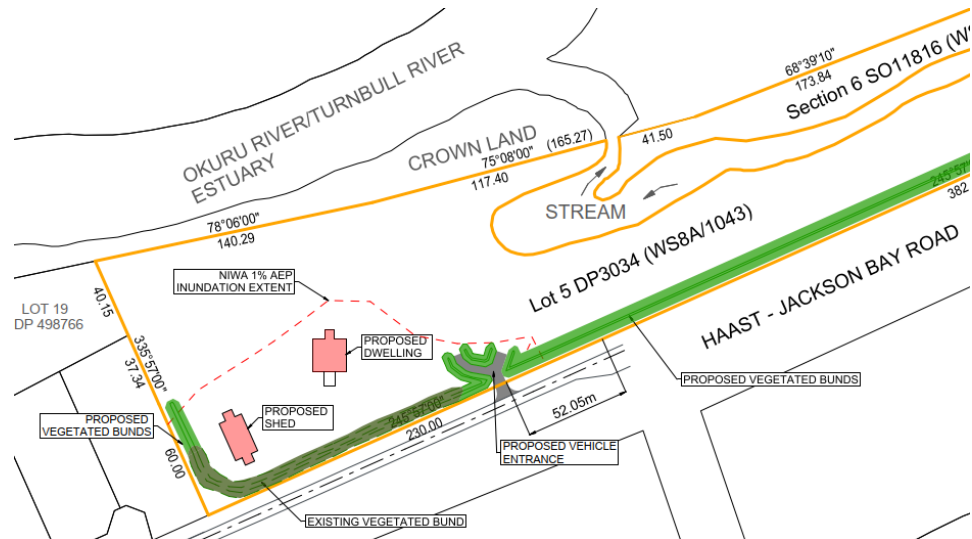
RC220133 Approved Plan A demonstrating the location of consented residential dwelling, and ancillary building on the Snowden property. The full extent of bunding on the site is not shown in the above figure.
